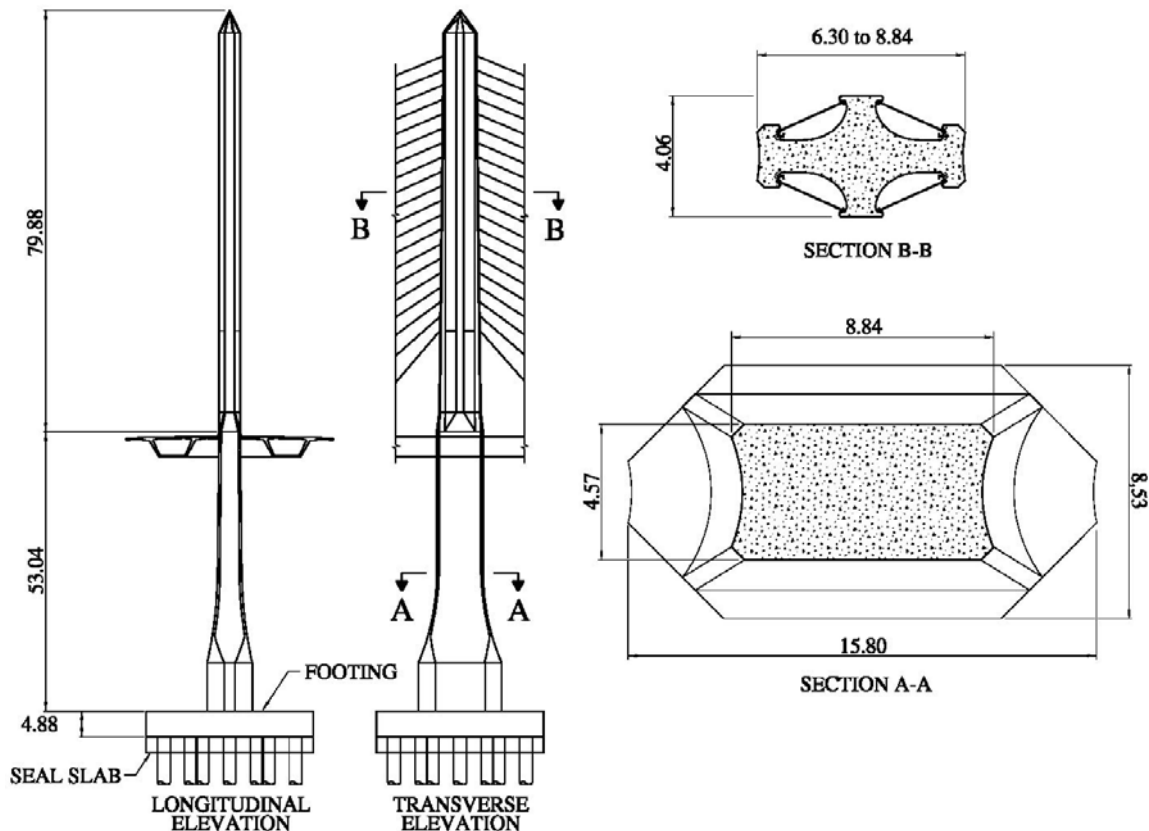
Elevation and cross-section views of the main pylon (all units m).
